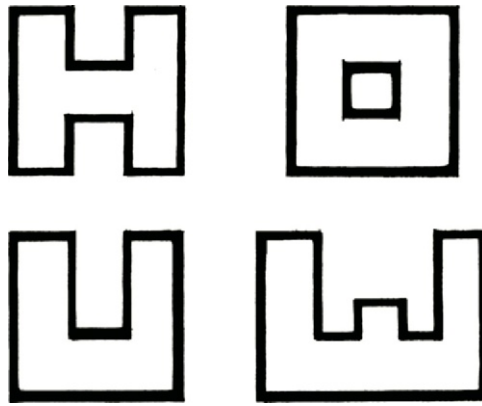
These were the common floor plans for large buildings prior to the twentieth century because of the need for light and ventilation.
